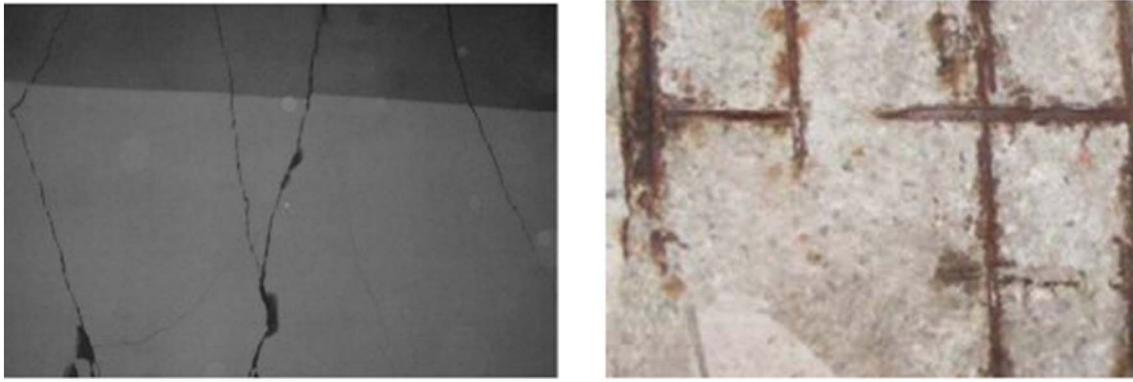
Crack observed in the lining of Longxi tunnel (left) [5] and concrete spalling with exposed reinforcing steel (right) [1].
